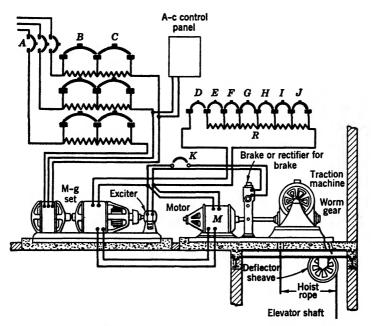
Schematic diagram of the control and power wiring of an elevator system, using an m-g set for supplying variable voltage to a geared traction elevator machine. In a gearless traction machine the shaft of the motor would be directly connected to the shaft of the traction machine.
